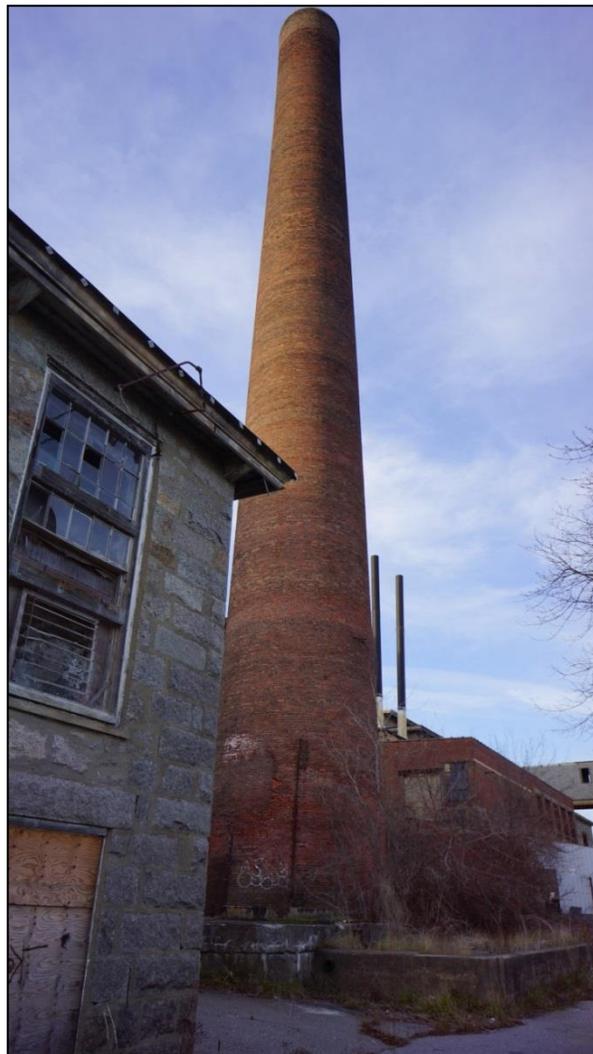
This photograph shows an overall view of the King Philip Mills chimney looking from the southeast to the northwest.
